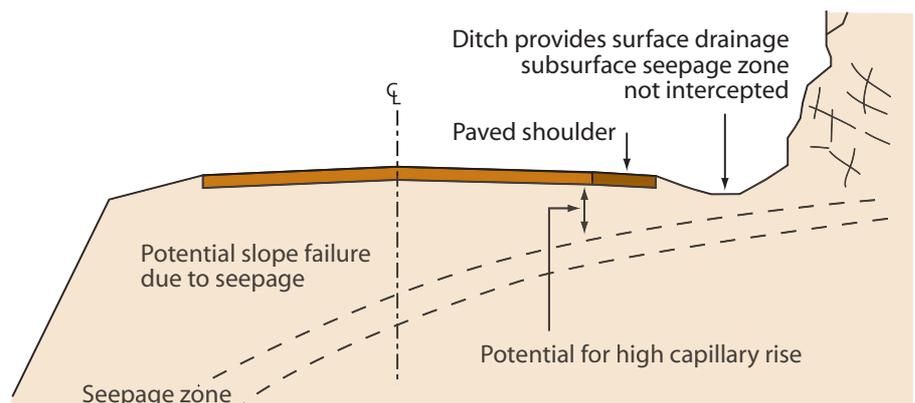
Typical drainage deficiencies associated with cut-and-fill pavement sections¹³
